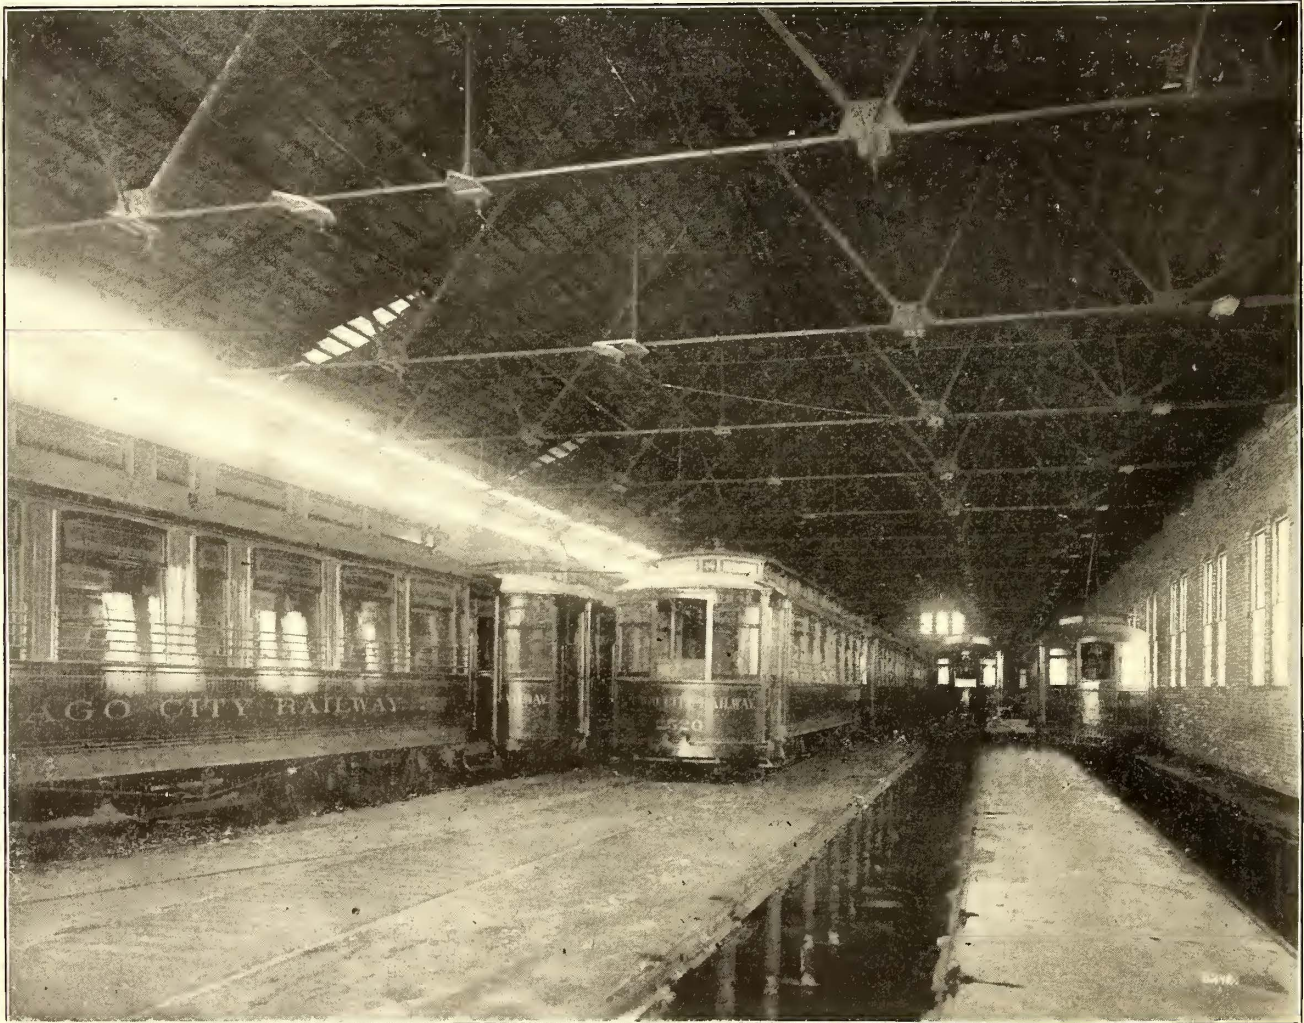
INTERIOR VIEW OF NEW CAR HOUSE
